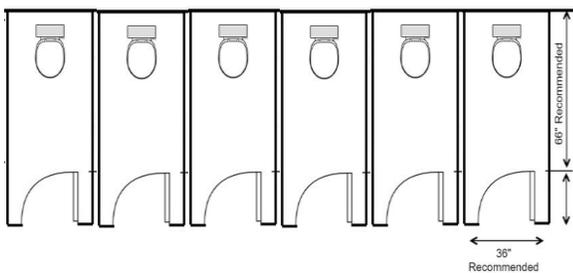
Floor Plan of the Centralized Toilet Room with Six Cubicles
